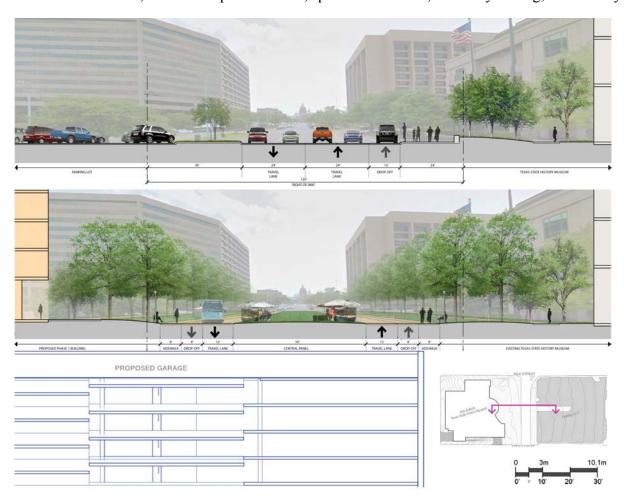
Existing Congress Avenue versus Proposed Texas Mall and Garage Sections¹⁷ Mall converts bi-directional street to boulevard with subterranean garage to replace surface parking.
